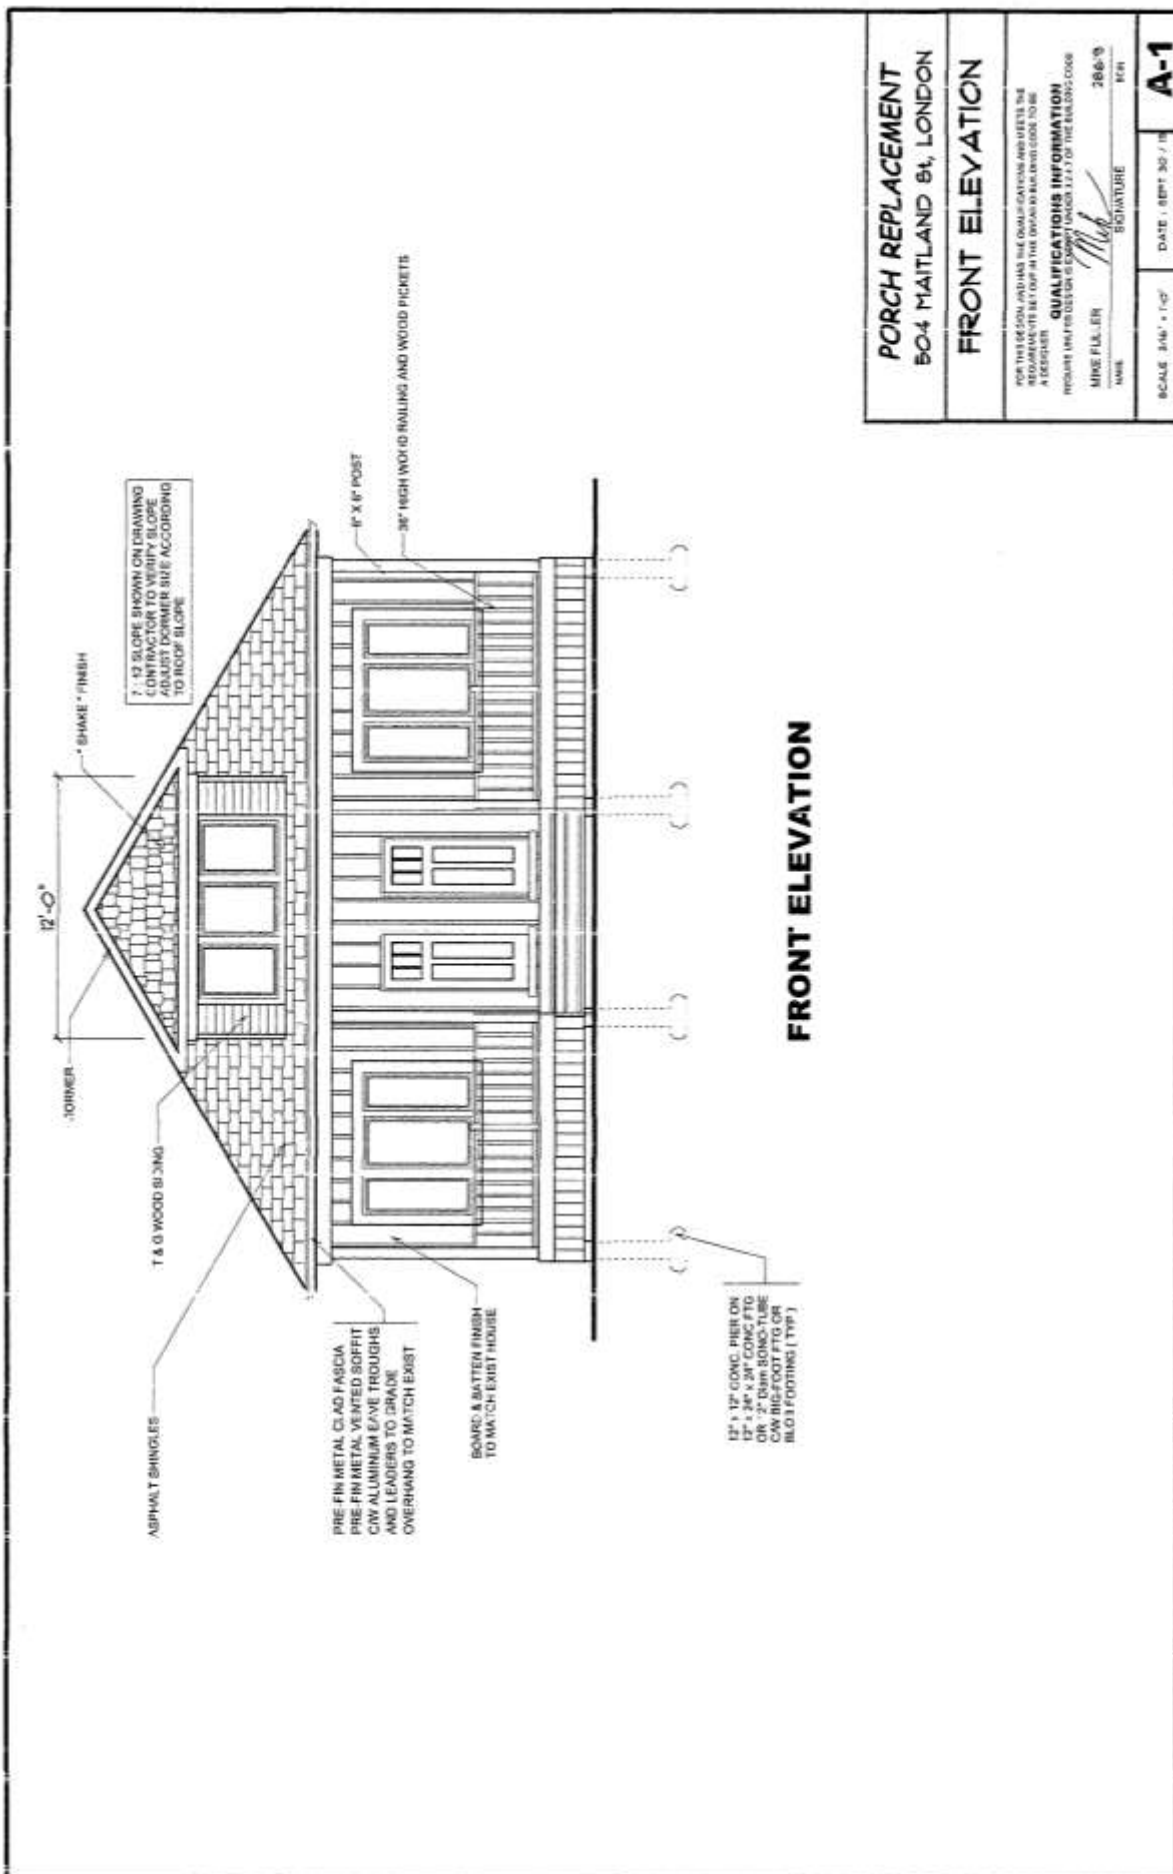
Front elevation, showing the proposed porch alteration and proposed dormer for the existing semi-detached dwellings at 504-506 Maitland Street. Note the application of the wood board and batten to wrap around the front elevation of the semi-detached dwellings.
